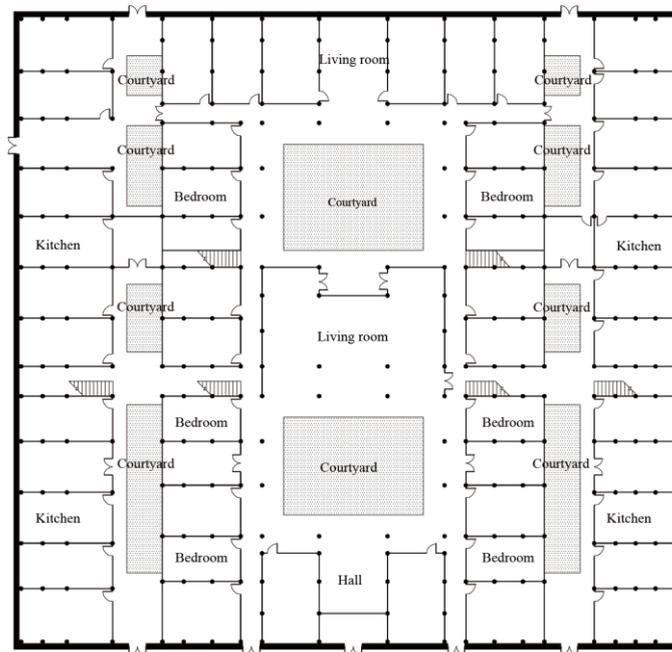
Plan of a traditional residential building (Jin 3-1) in Jinhua Yuyuan Village
